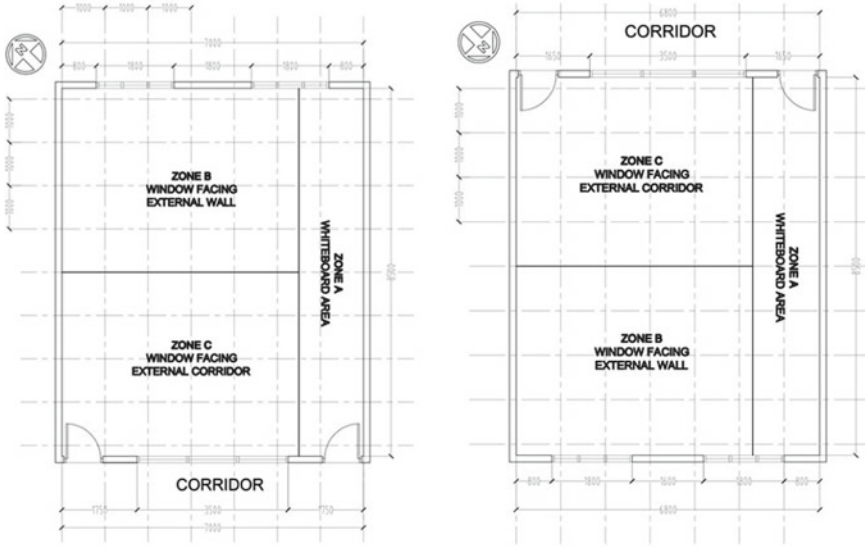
Floor plan of classroom PNP-001(left) and PNP-019 (right) [17, 18]
